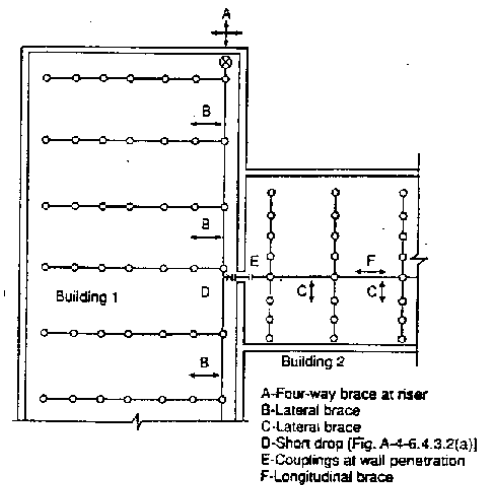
(a) Earthquake protection for sprinkler piping.
